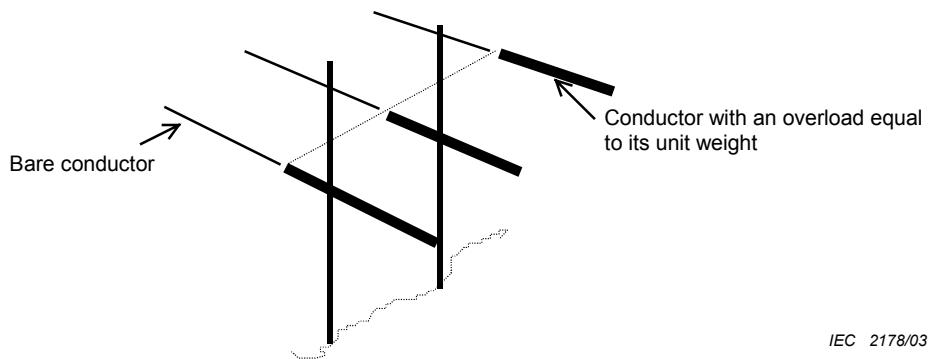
Simulated longitudinal conductor load (case of a single circuit support)
